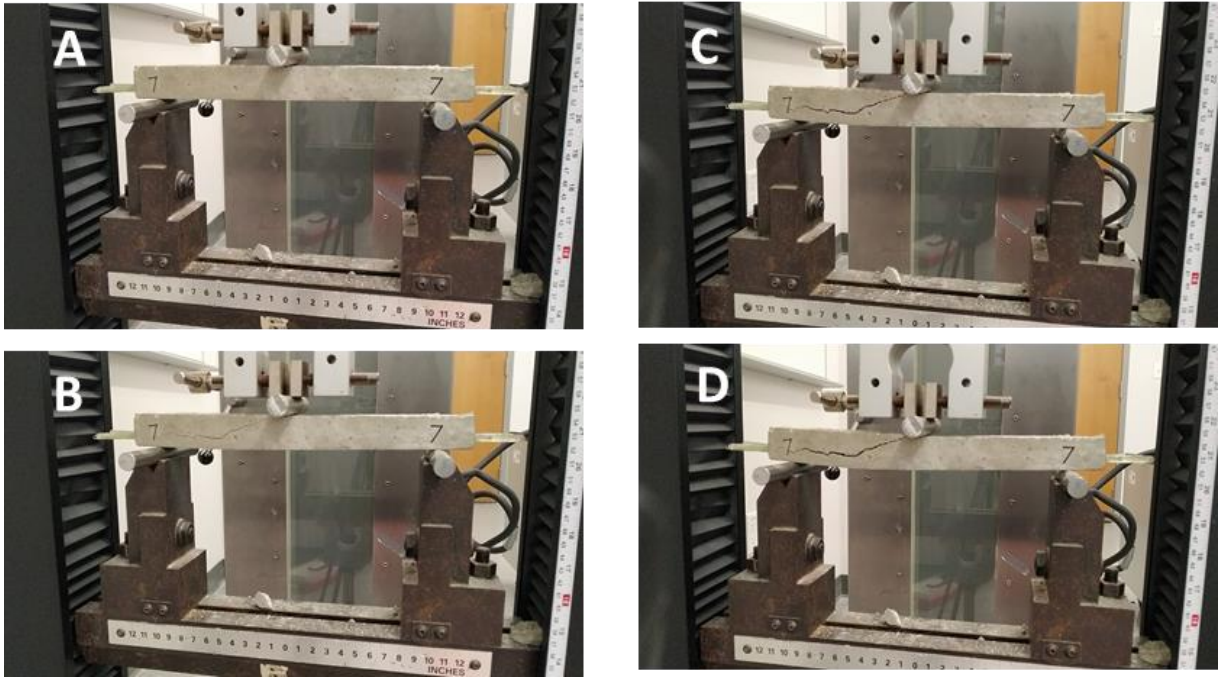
The crack process of a concrete beam, which was cut the top half, with the E-glass FRP rebar which the volume fraction of the glass fiber is 70%.
